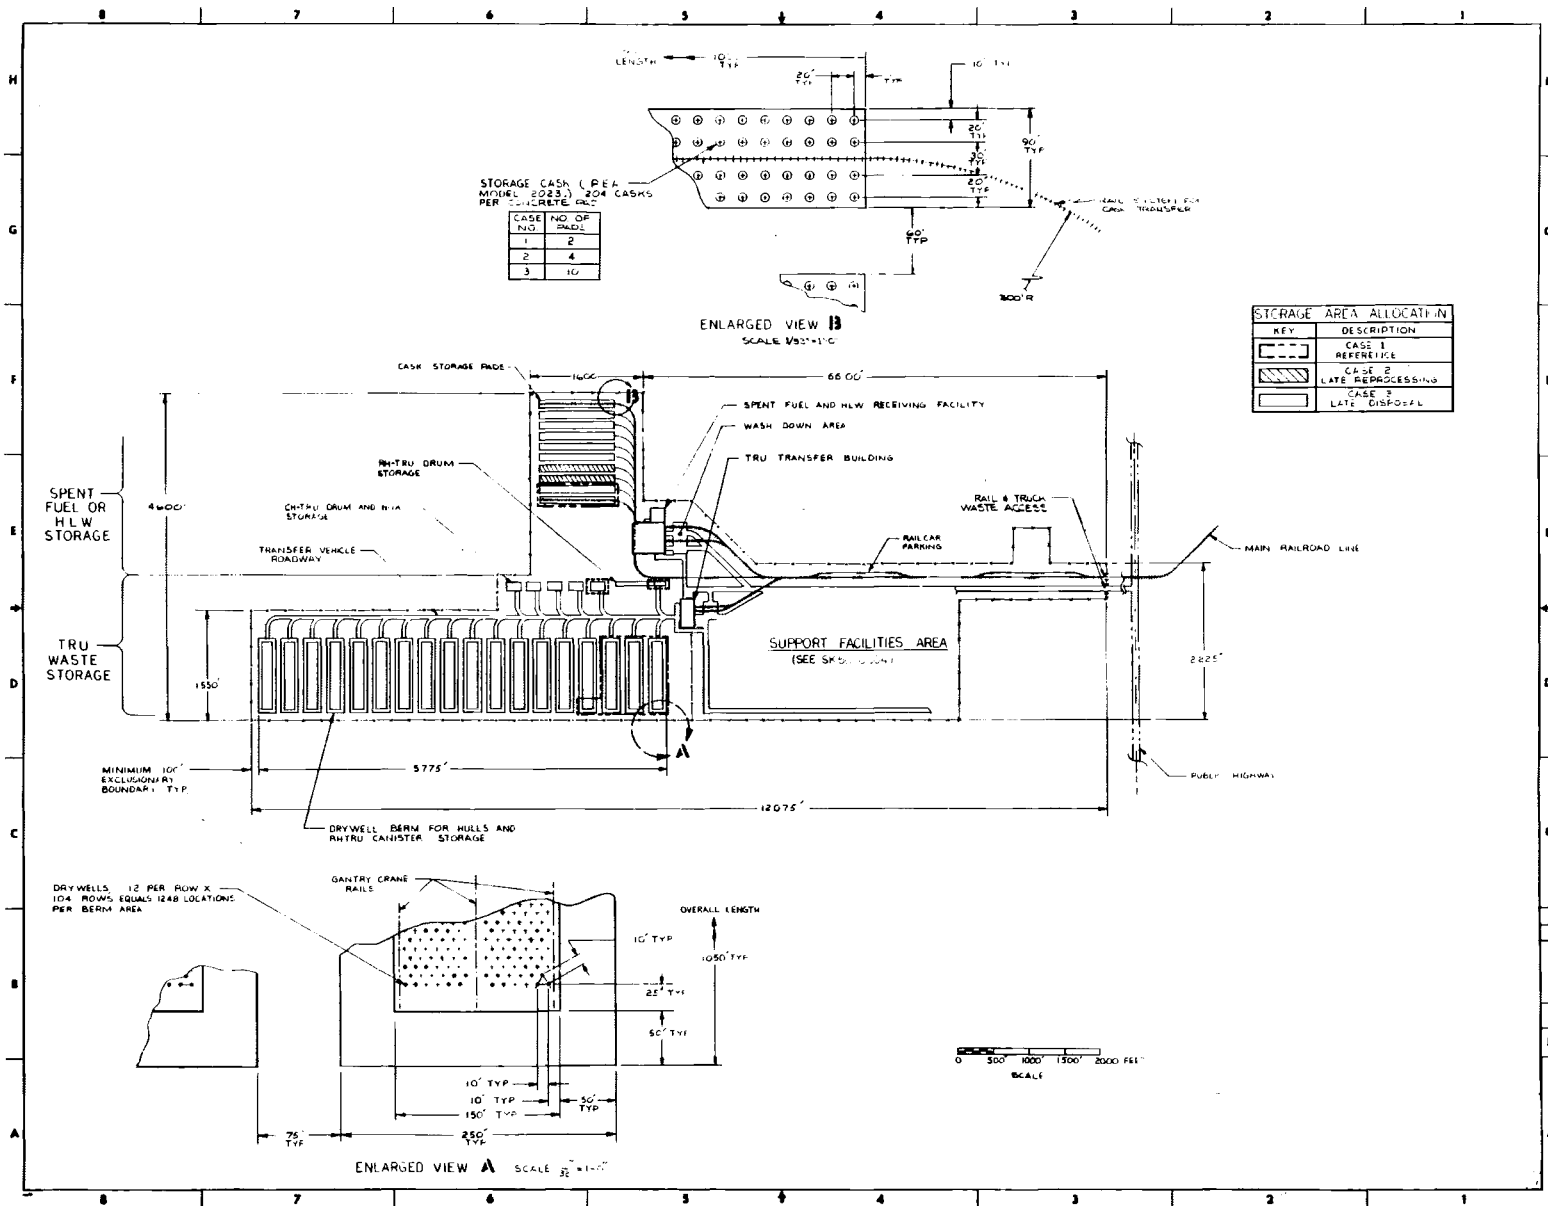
MRS/IS Stand-Alone Facility Cask Storage Site Plan
